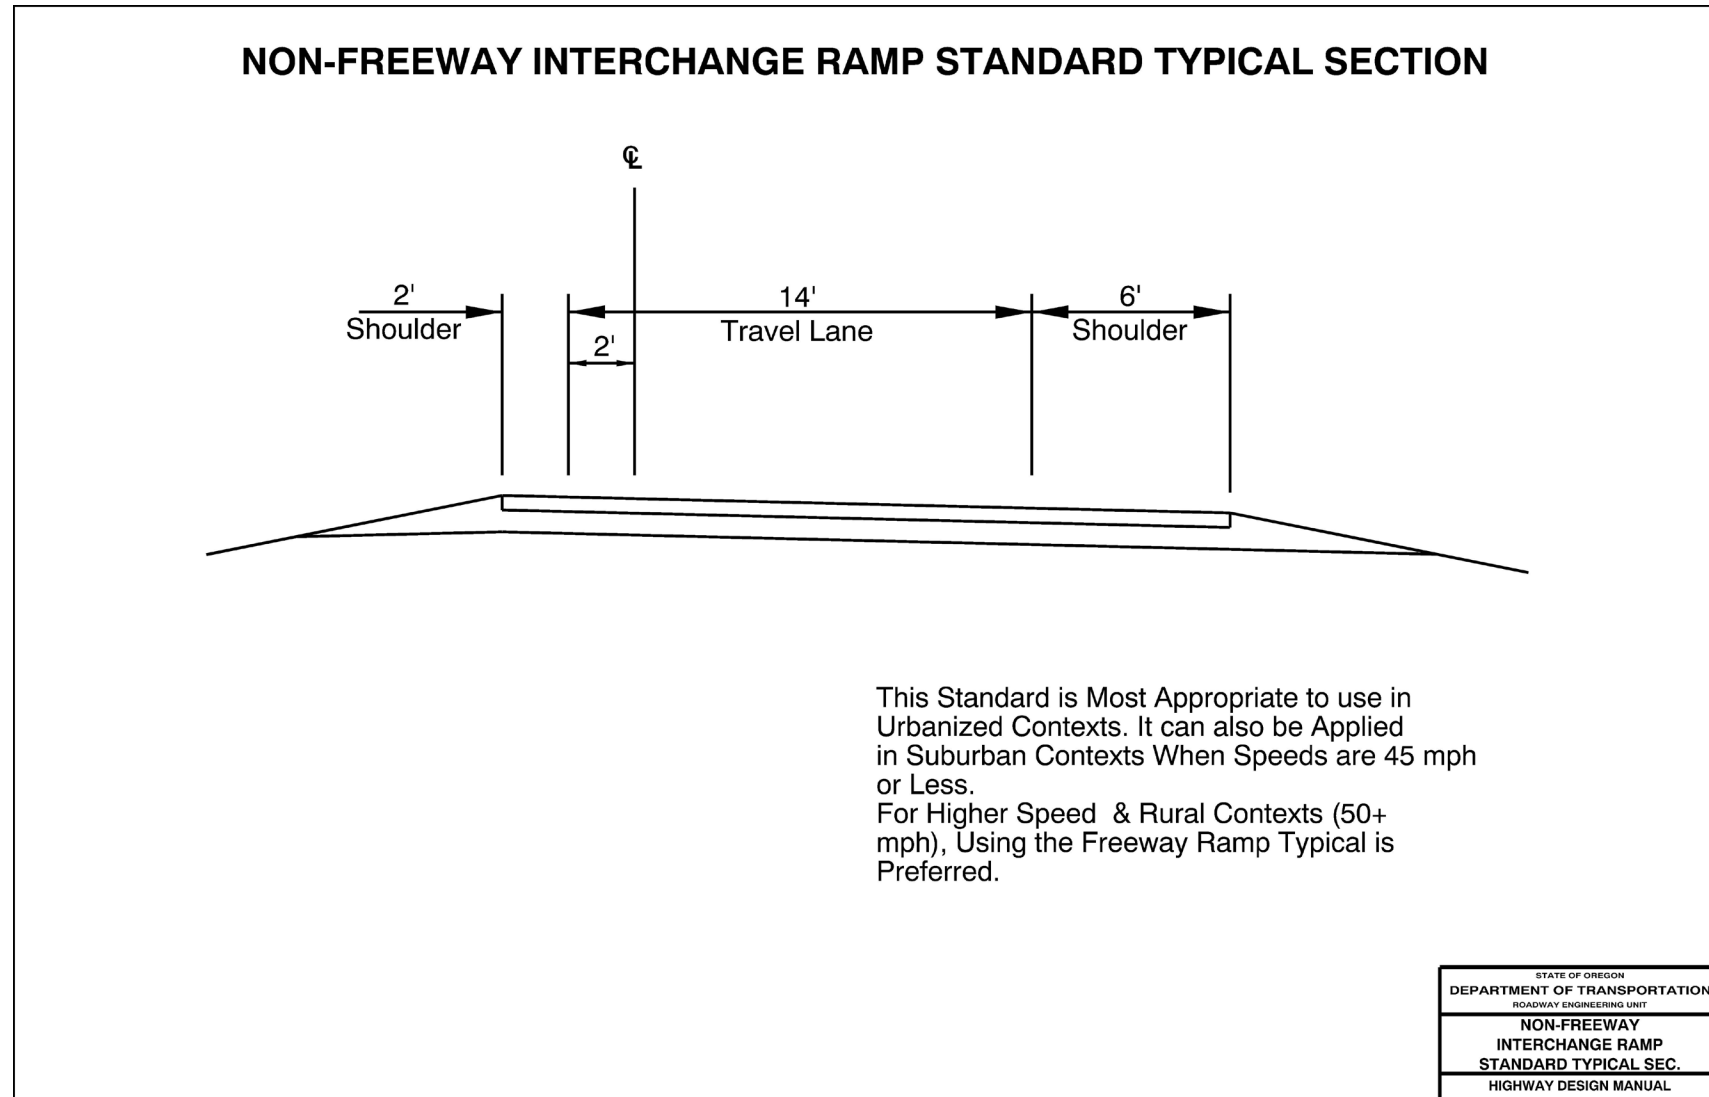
Non-Freeway Interchange Ramp Typical Section
